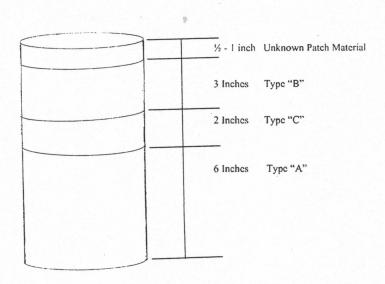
Diagram of Existing Asphalt Layers, Prior to NH-186(190) Construction.
